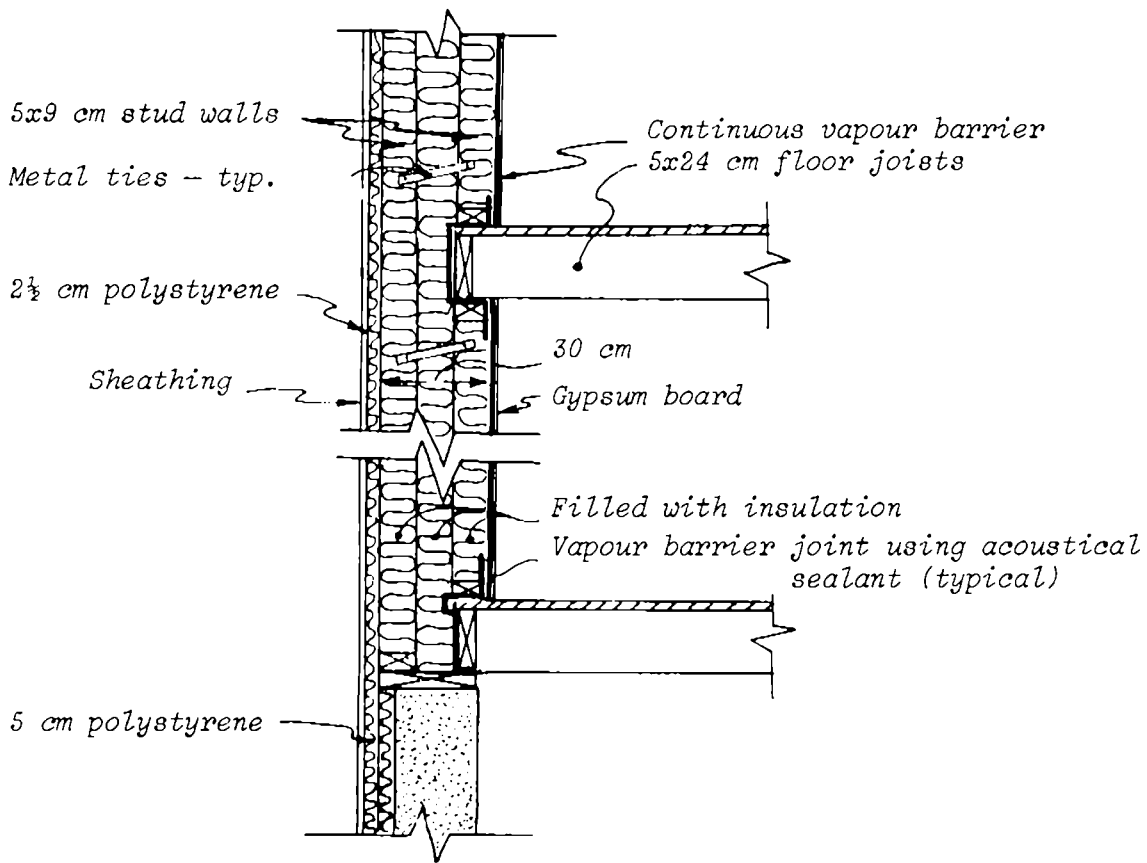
Vapour barrier used to prevent air exfiltration through the ceiling area.
